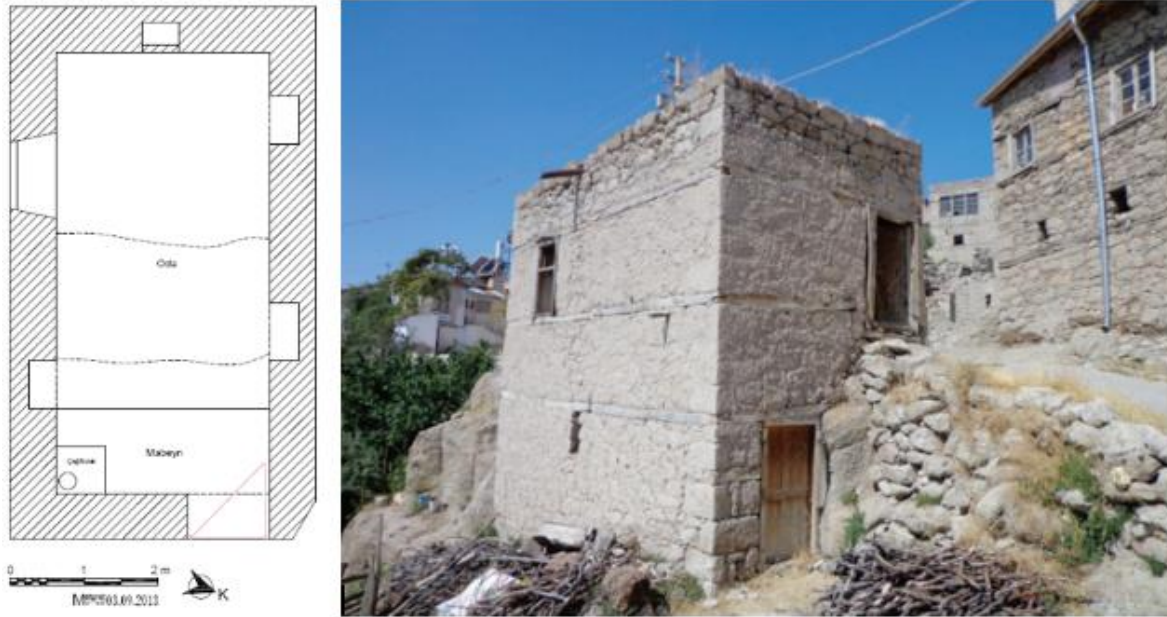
Konya Göktürk (Kilistra) Village Room, Left: Plan of the Room, Right: General View of the Room (Bozkurt, 2016).
